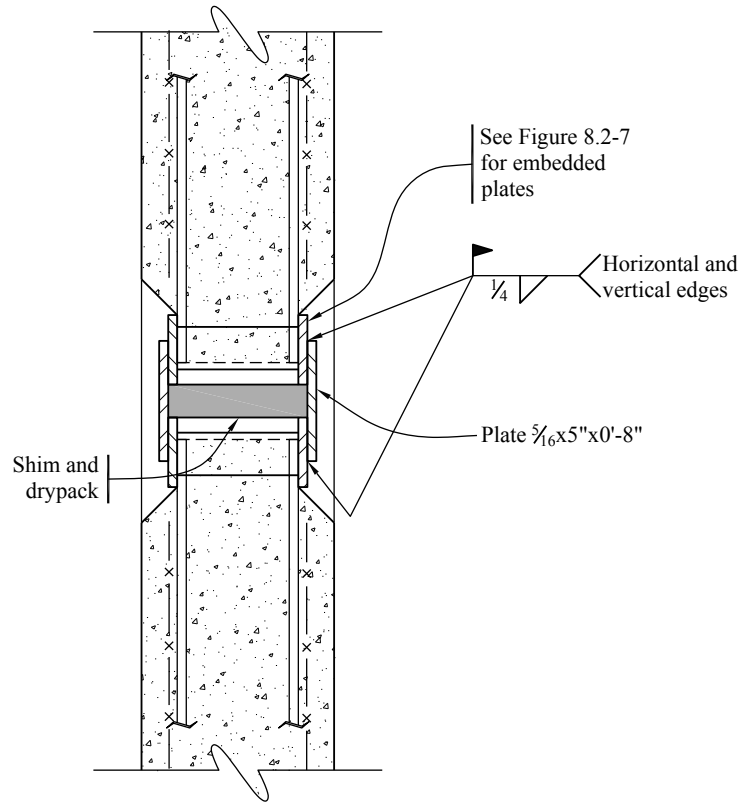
Shear connections on each side of the wall at the second and third floors
